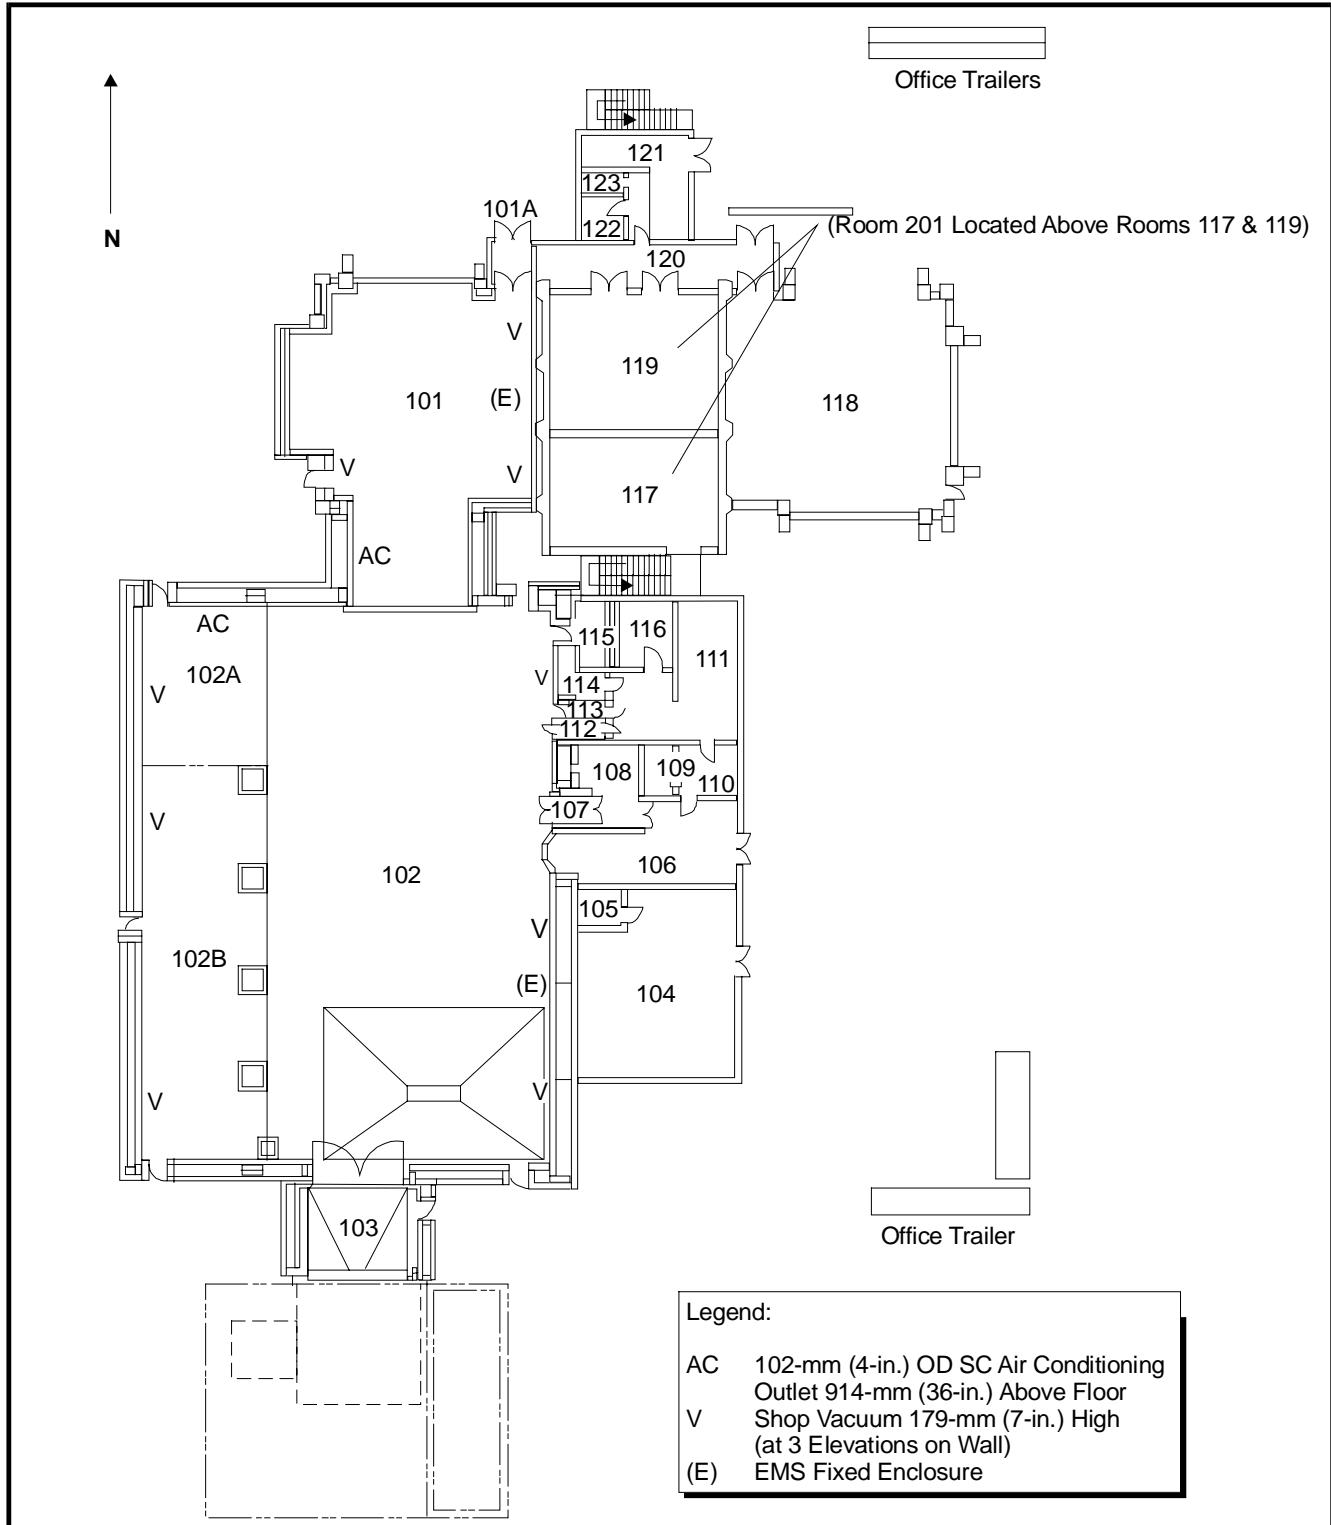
Building Floor Plan for SAEF 2
